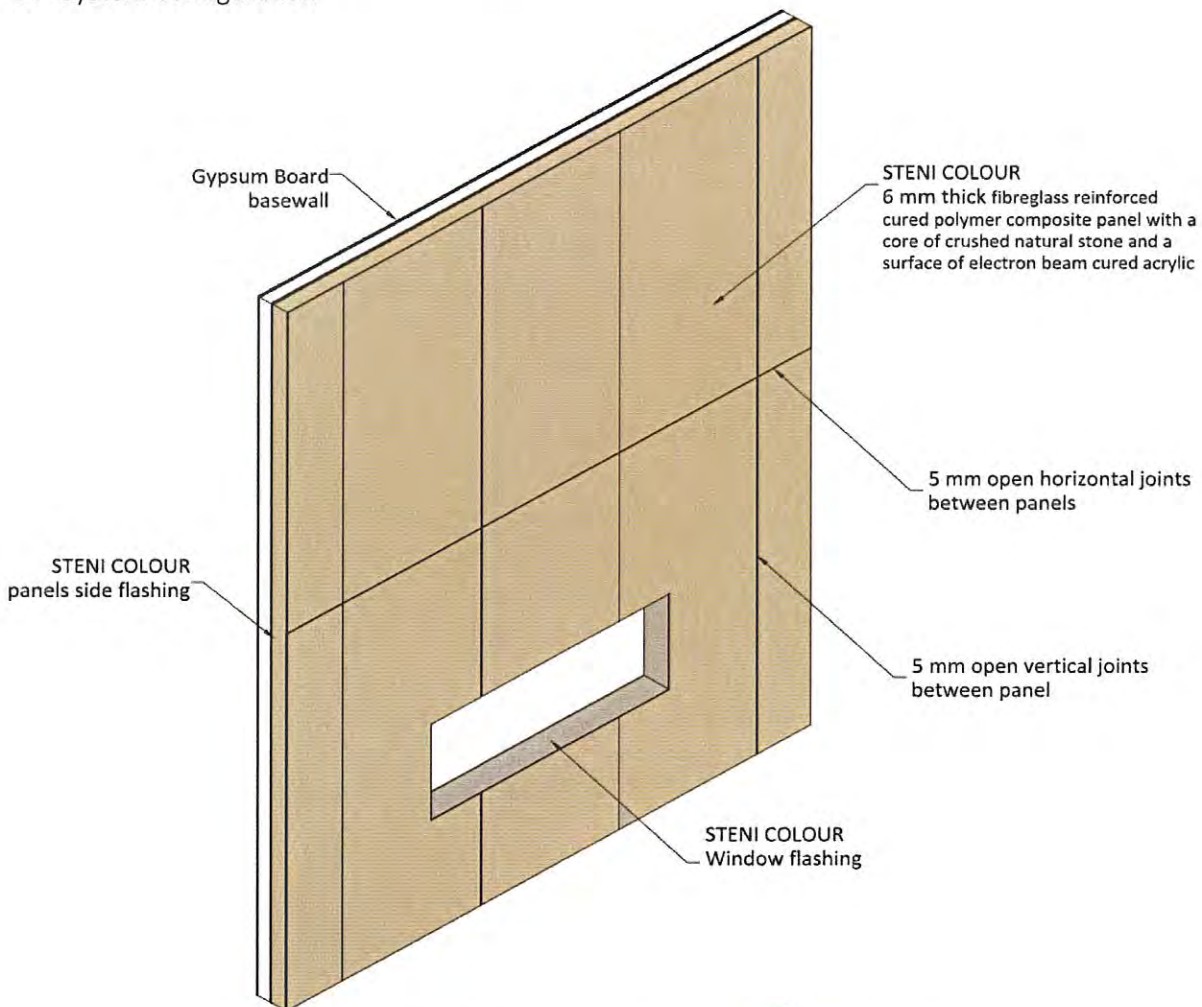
"Steni Colour" 6-mm thick panel exterior cladding assembly elevation
